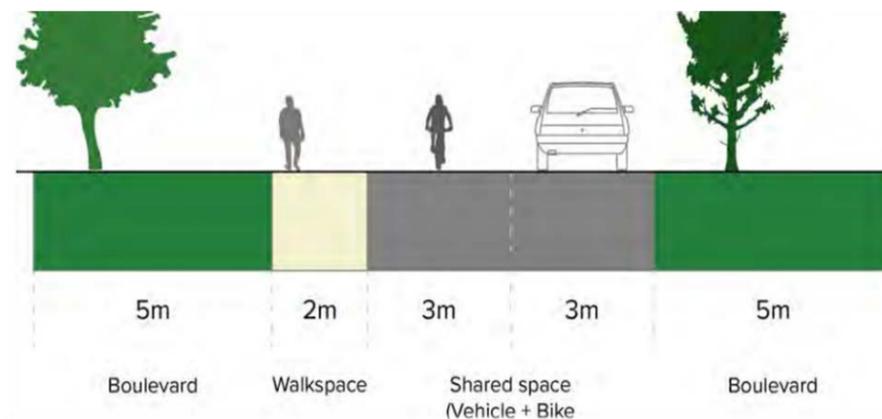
Local Road Cross-Section Design (City of Revelstoke Transportation Master Plan)
